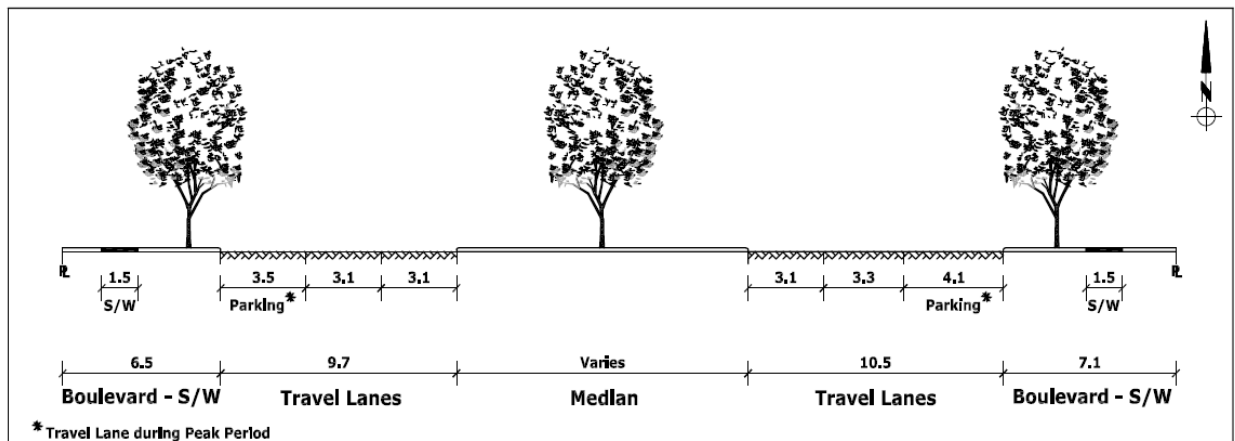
49<sup>th</sup> to King Edward Avenue - Typical Pre-construction Configuration
